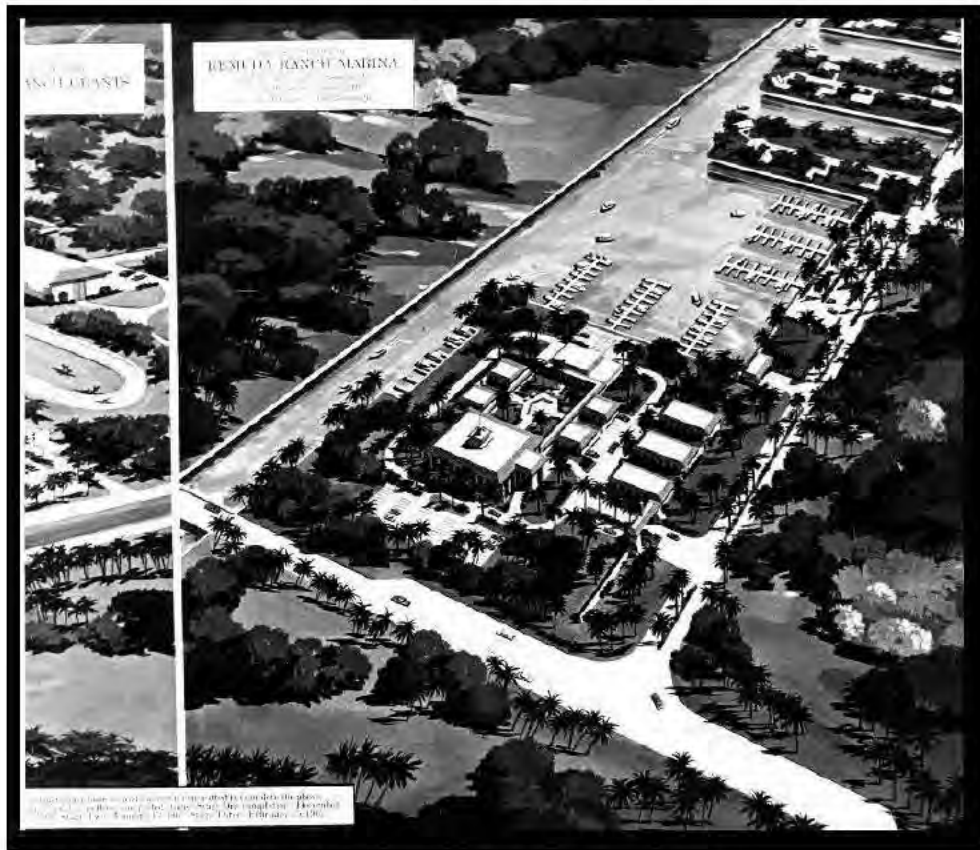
1966 Remuda Ranch Original Layout Press Photo
